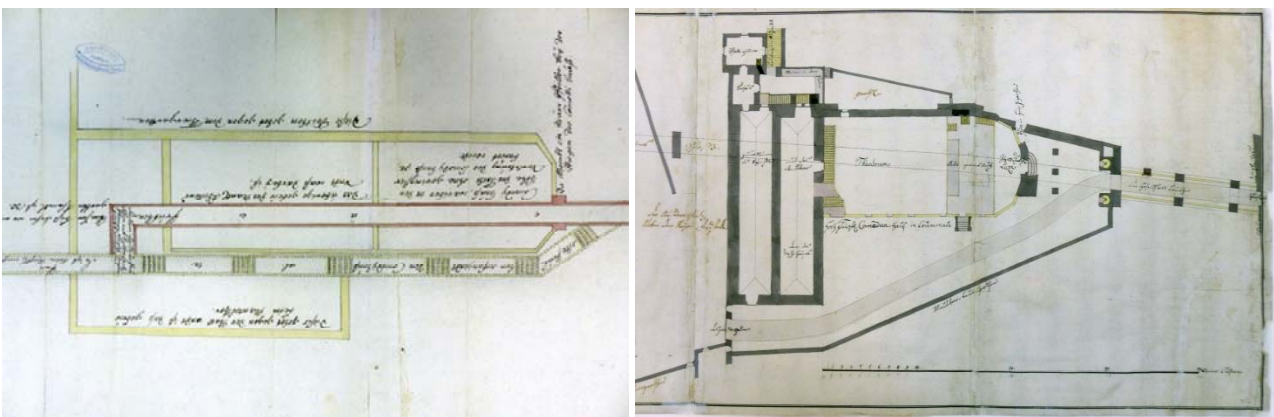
Plan from the beginning of the 18th century (left) shows linking of a new upper corridor with the already existing western bridge leading into the garden. It is clear that the old bridge had a long staircase rising along the southern wall of the theatre building. Another plan (right) shows the situation circa 1750 when both corridors were already aligned.
